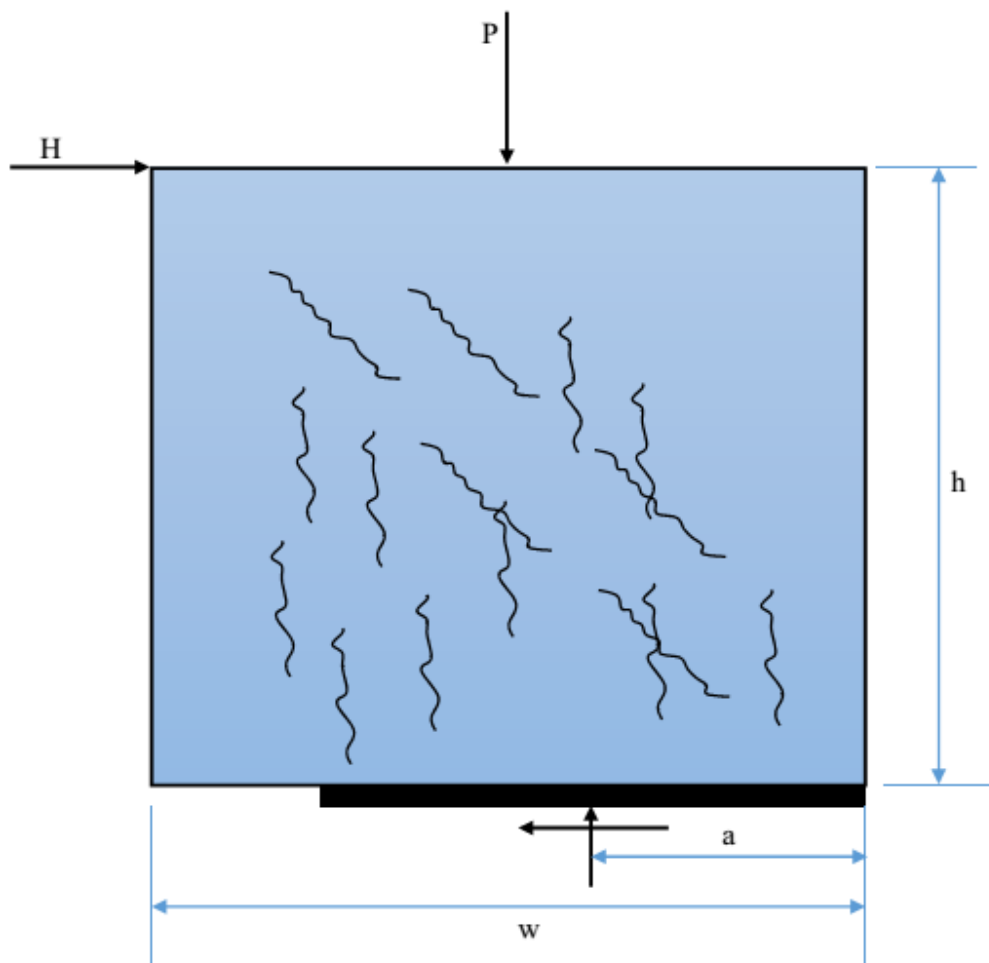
Simple Mechanistic Model of Wall Behavior for Damaged Wall
